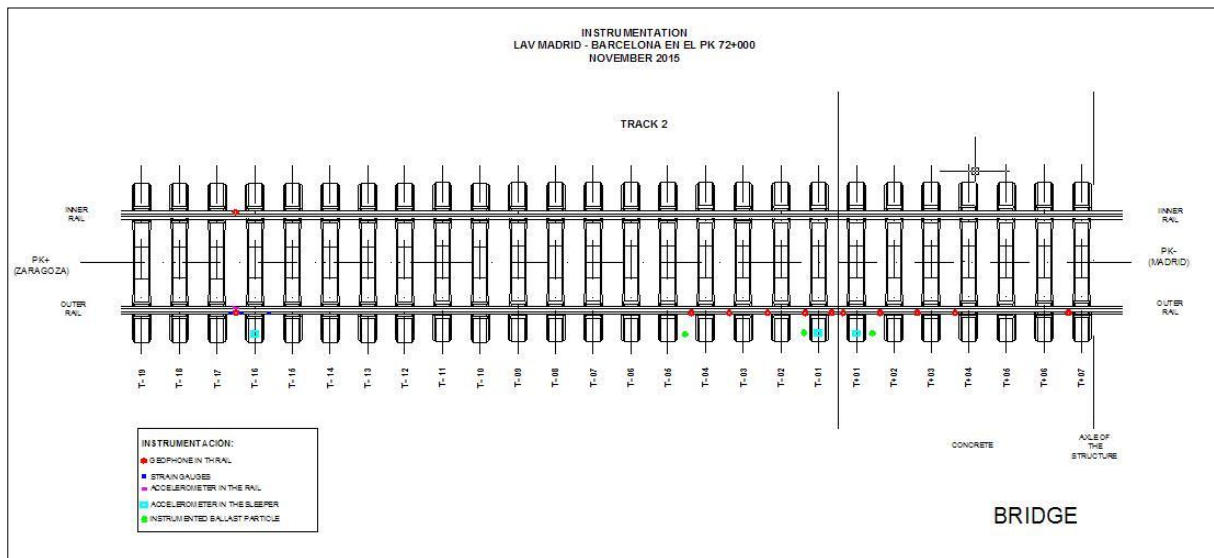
SKETCH OF THE INSTRUMENTED SECTION
